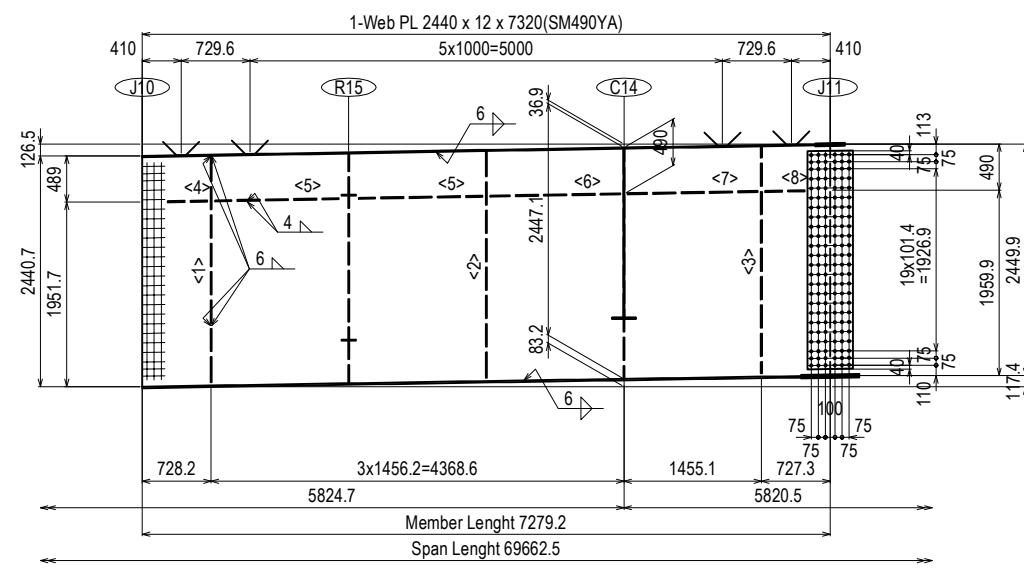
DETAIL OF MAIN GIRDER G1 (PF2-PF5) (11) S=1:80
